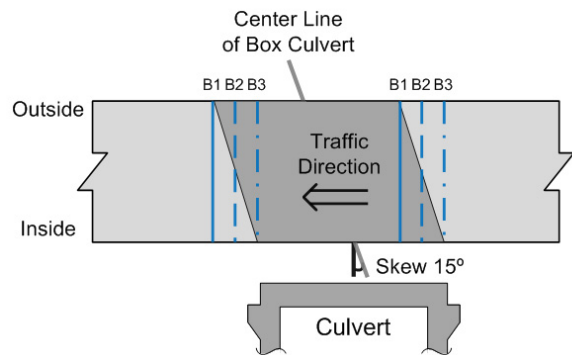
Joint Positions in Slab over 15° Skewed Box Culvert
